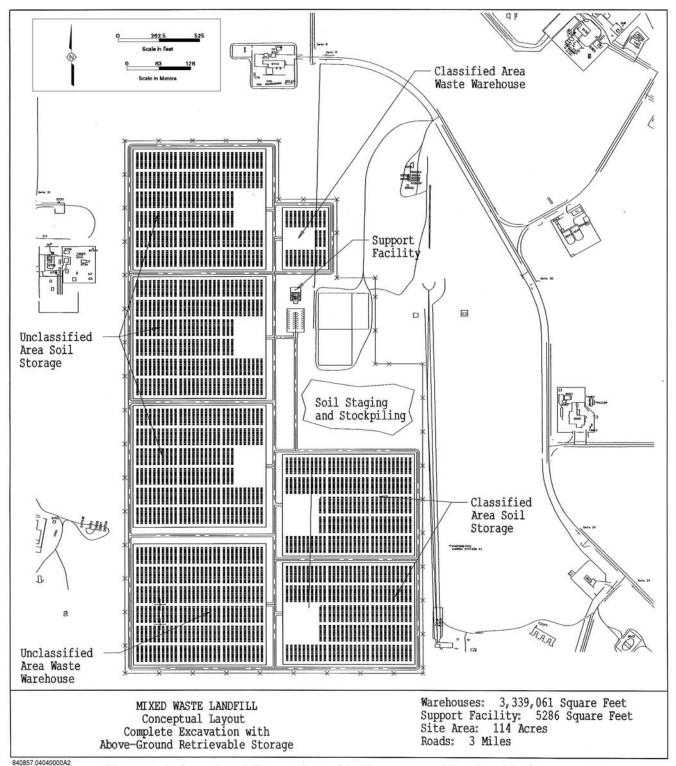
Completed Excavation with Aboveground Retrievable Storage
